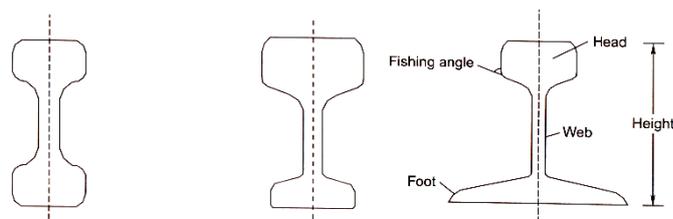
Double headed rail, bull headed rail, flat-footed rail
